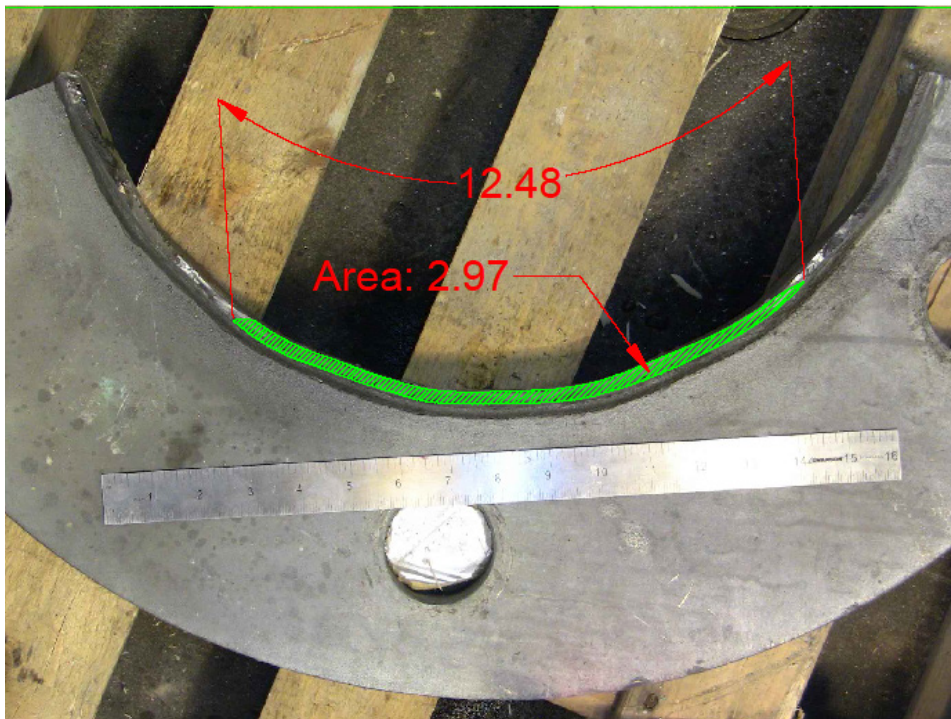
Photo. Specimen 2G2 fracture surface.
